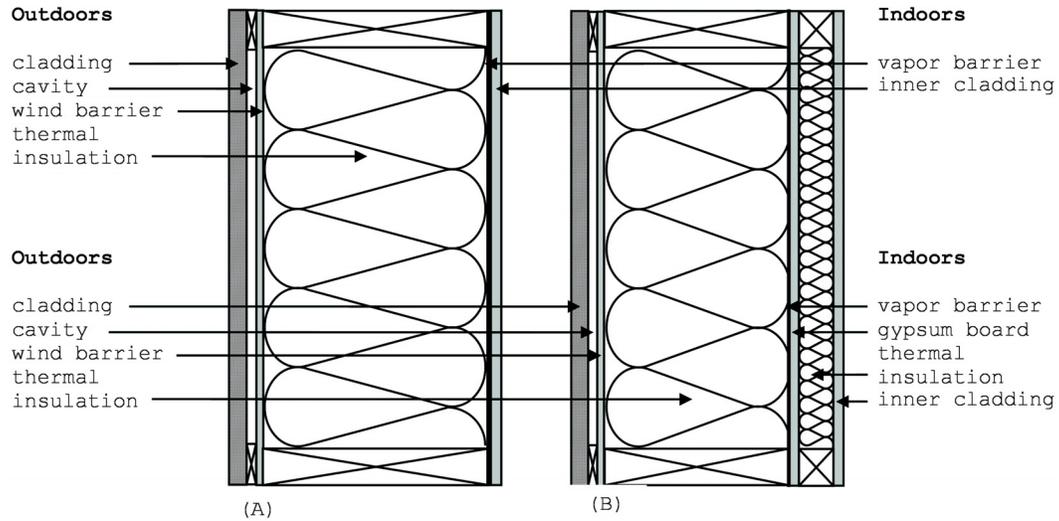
Horizontal cross section of typical elements; outdoor side at left. (A) Element with façade cladding, cavity, wind barrier (9 mm moisture-resistant gypsum board), 285 mm of thermal insulation material, vapor barrier, and inner cladding (13 mm interior, paper-faced gypsum board). (B) Element with façade cladding, cavity, wind barrier, 190 mm or 240 mm of thermal insulation material, vapor barrier, gypsum board (13 mm interior, paper-faced gypsum board), 95 mm or 45 mm of thermal insulation material, and inner cladding.
